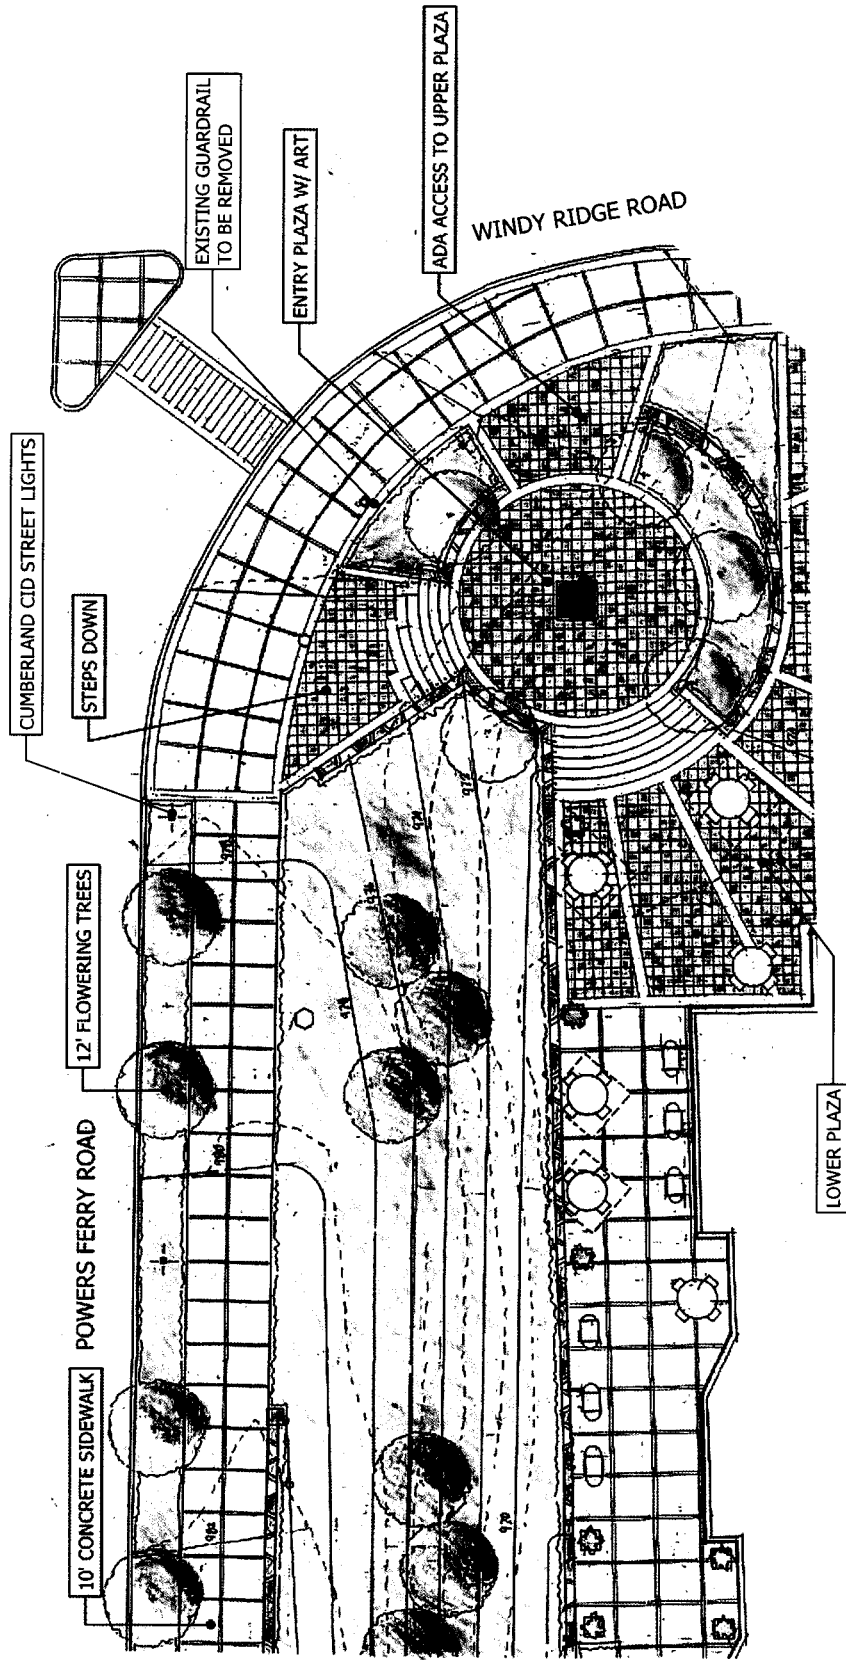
EXHIBIT F: CURRENT SITE PLANS WITH AREA FOR CORNER PARK IDENTIFIED
